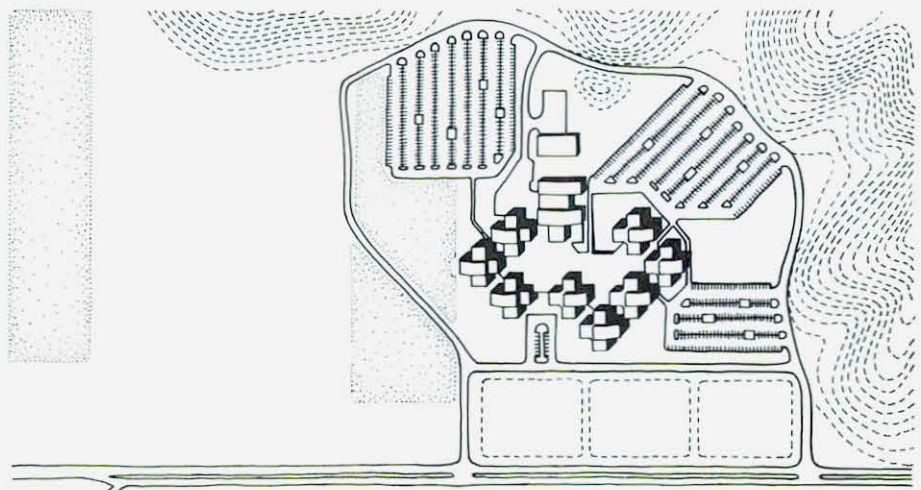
SCHEME 7E/SITE PLAN.
